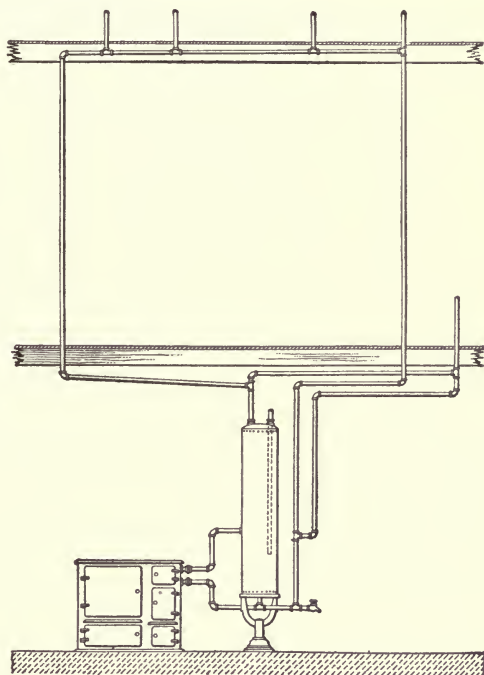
Method of Supplying a Fixture Near the Boiler.
